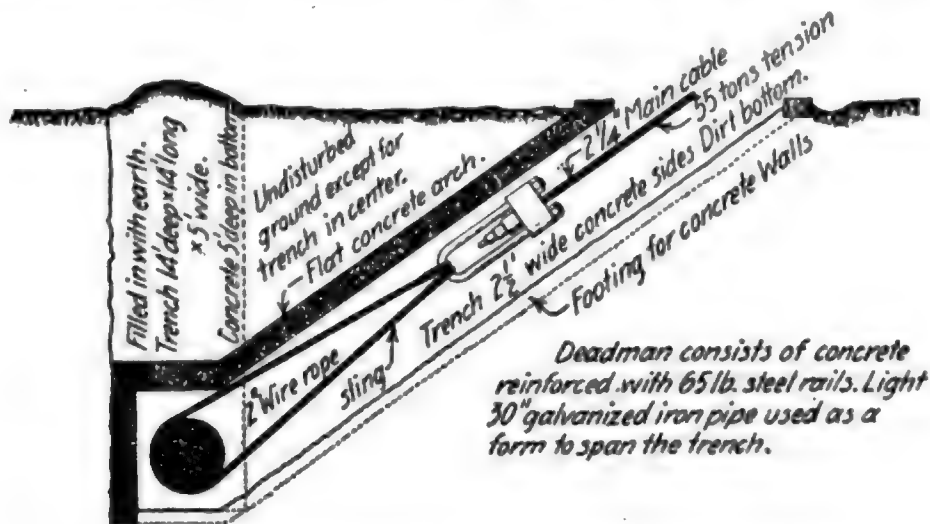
CONCRETE ANCHORAGE FOR MAIN CABLE.
